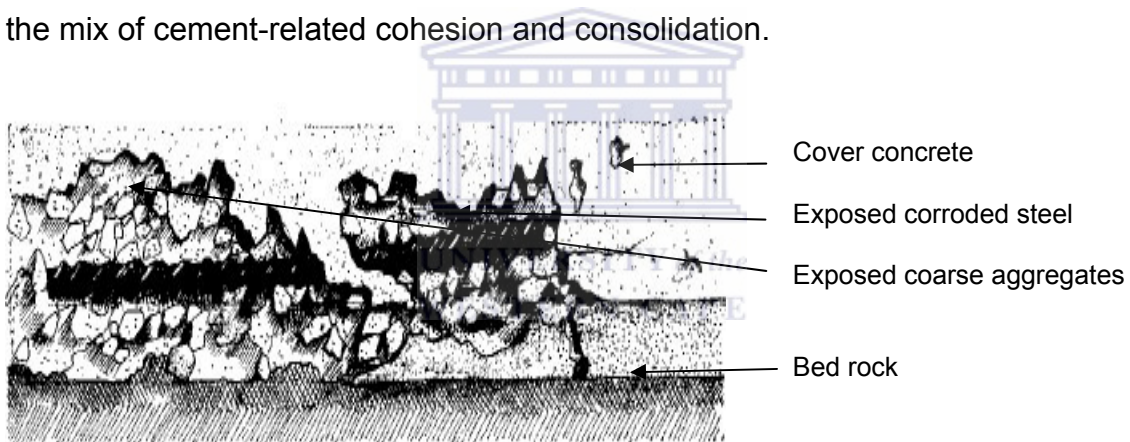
Spalling mainly caused by expansive corrosion acting on reinforcing steel.
